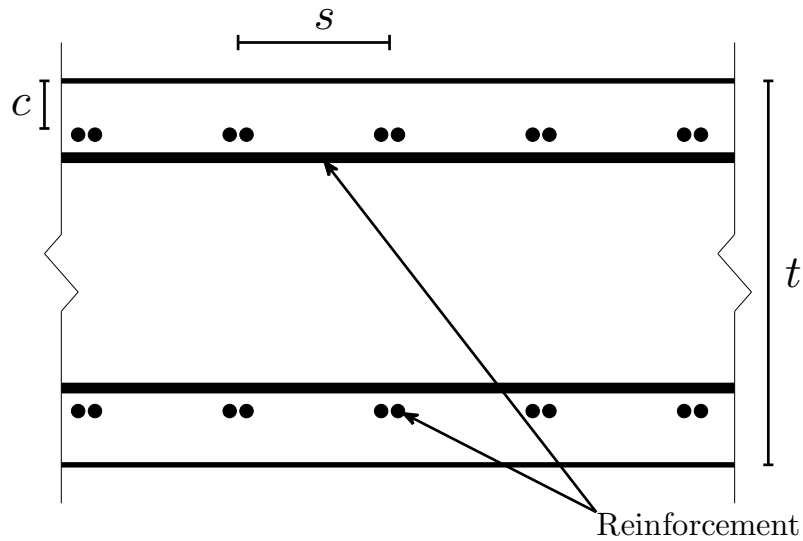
Cross section of a typical wall with thickness t , reinforcement spacing s and reinforcement cover c .
